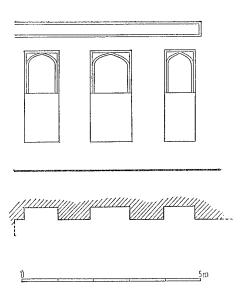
Qum, Mūsā-ī Mubarqa°, plan and elevation of side wall of entrance corridor.
